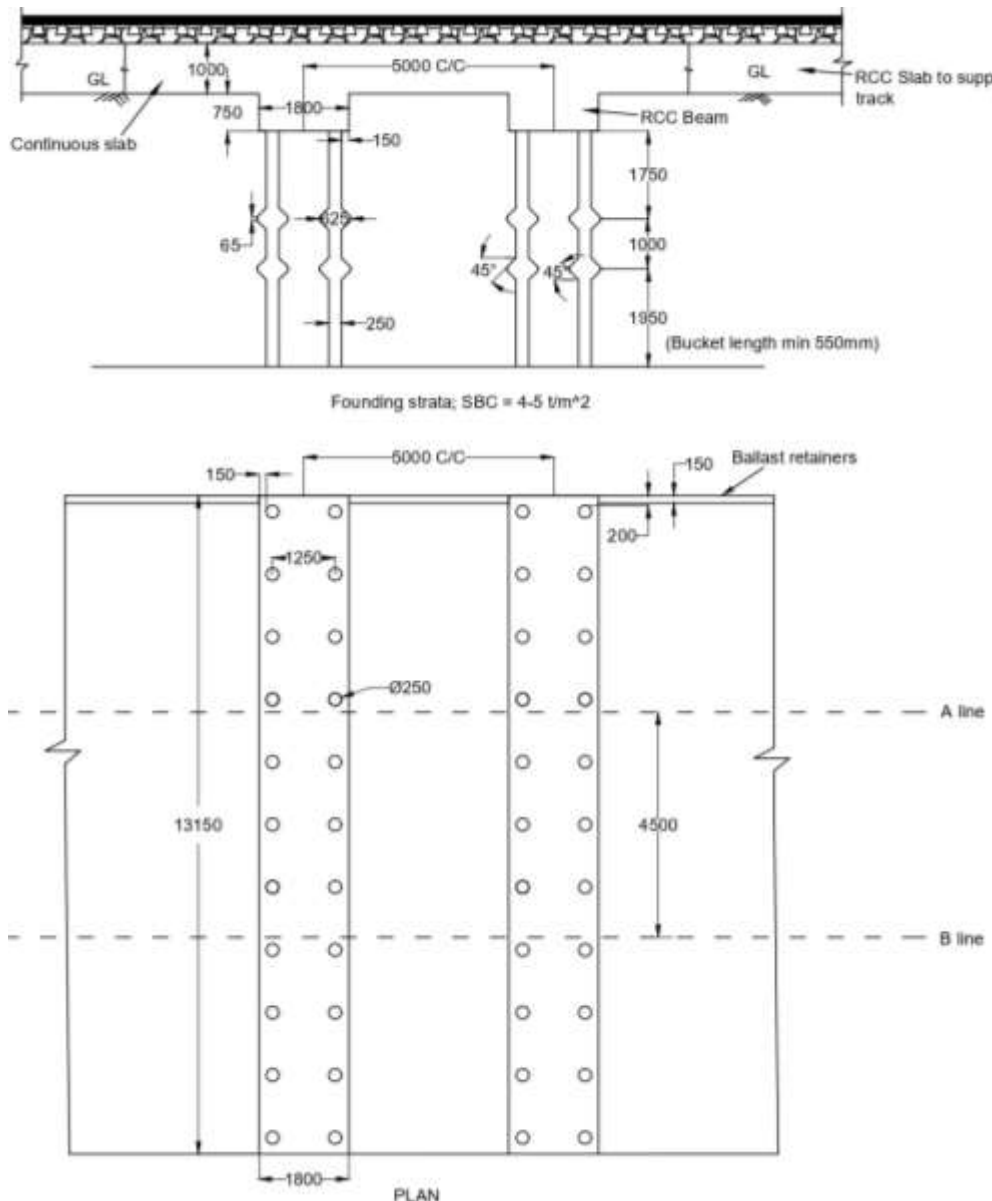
Arrangement of embankment of zero height with under reamed piles
